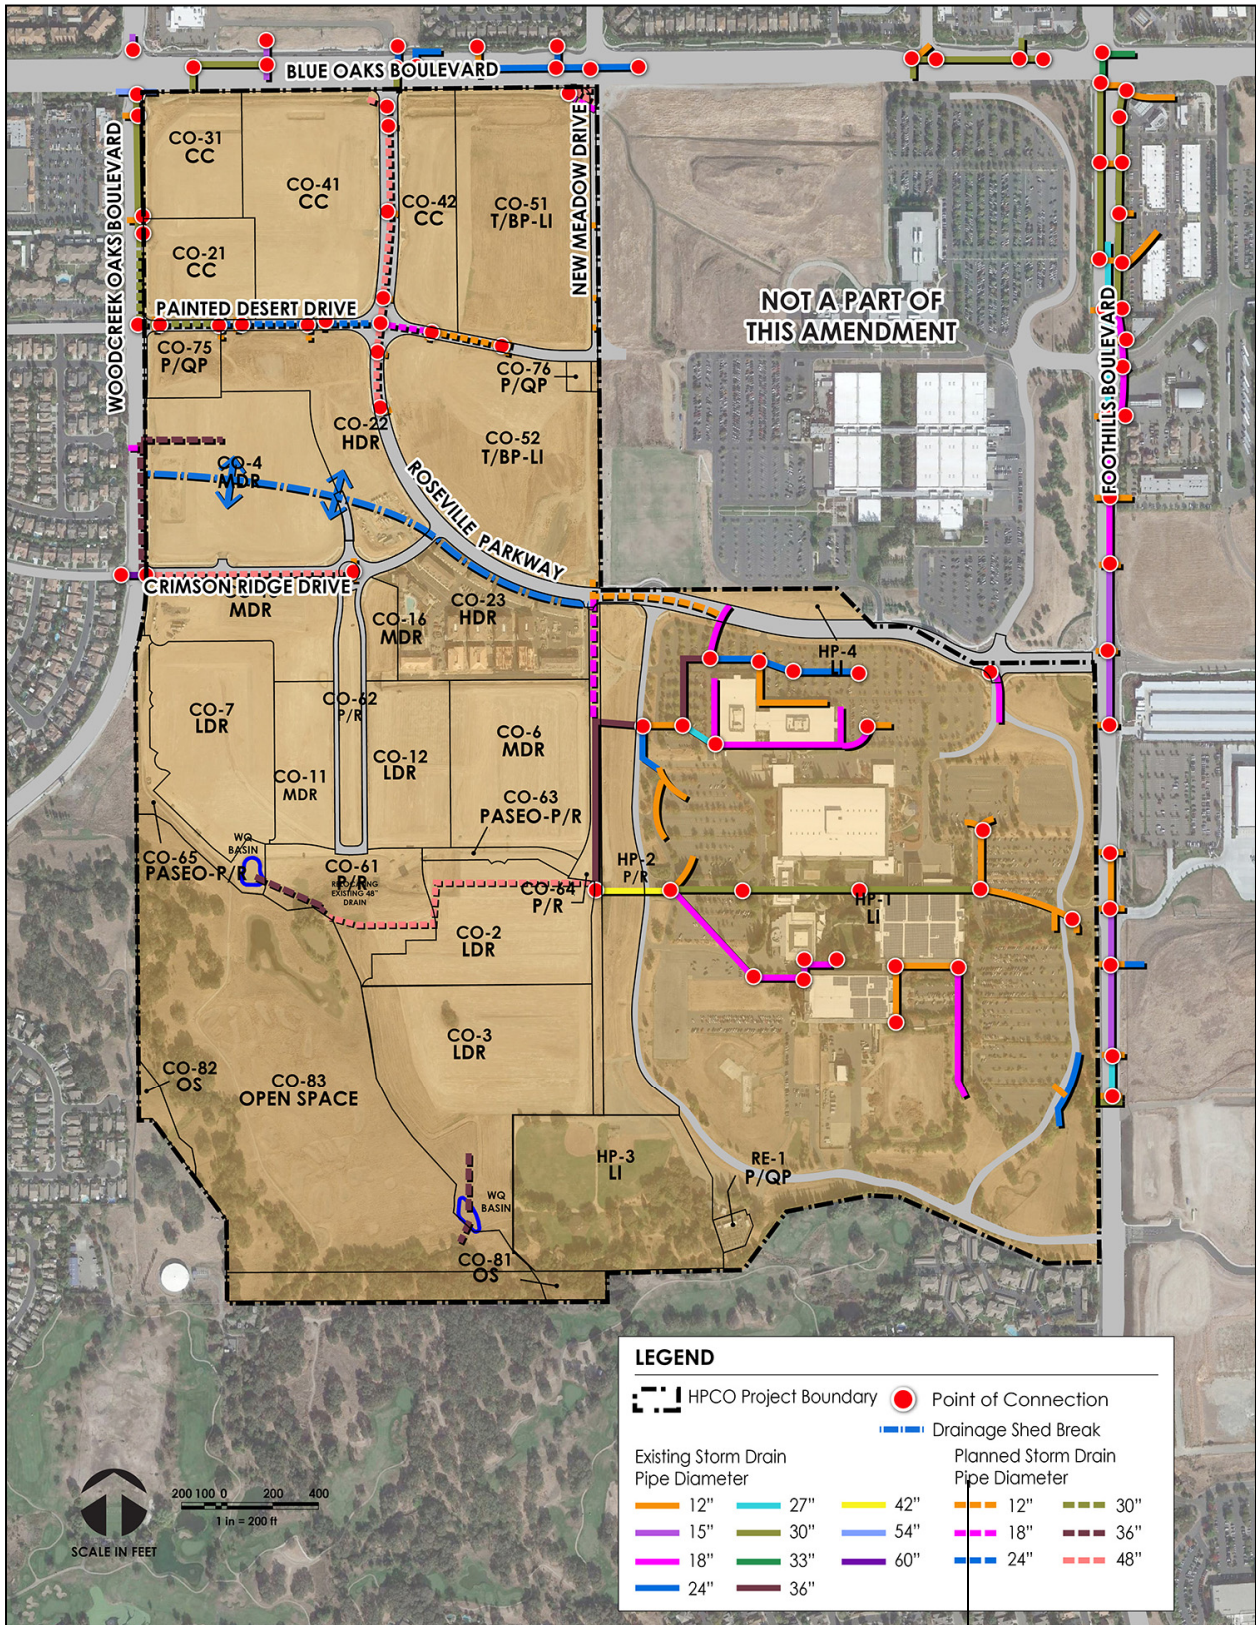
Backbone Drainage Improvements - Figure Modified
